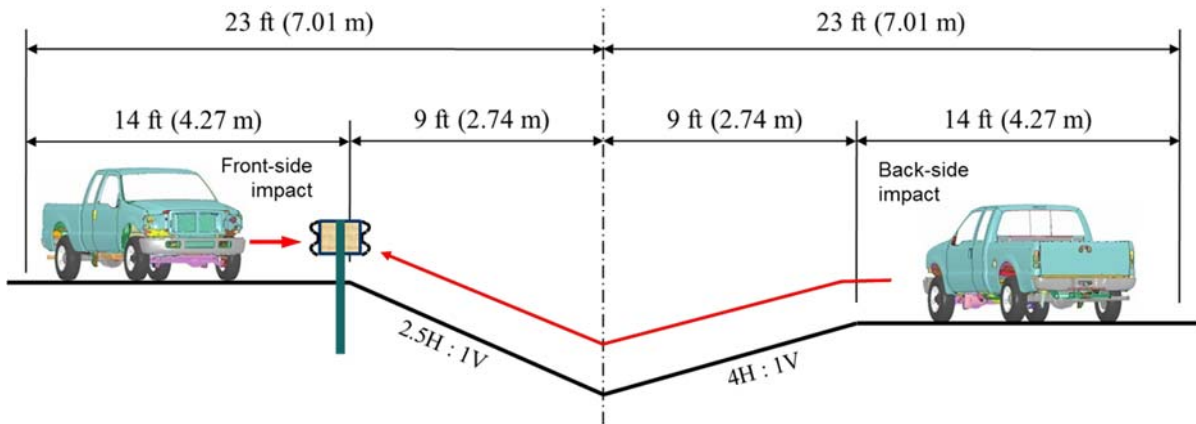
Front-side and backside impact on a 46-foot sloped median with 29- and 31-inch double-faced guardrails installed on a 2.5H:1V slope.
